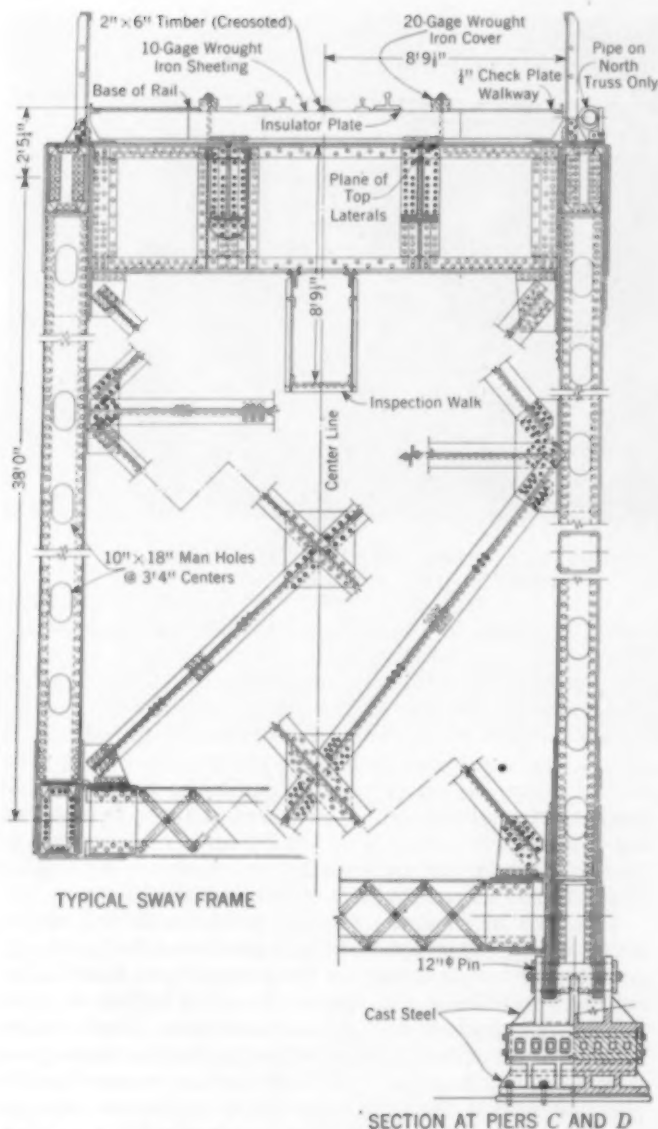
COMPOSITE CROSS SECTION OF BRIDGE SHOWING SWAY FRAME AND BEARING SHOE
